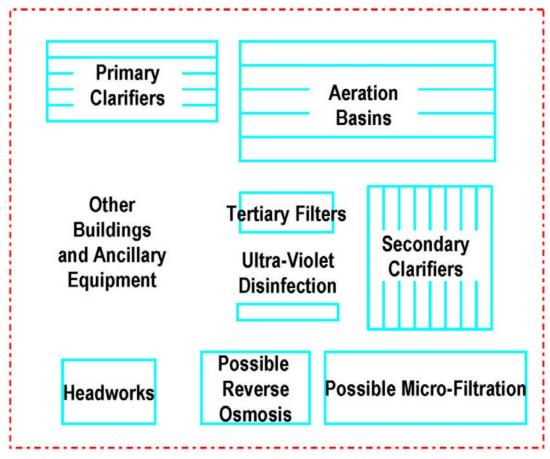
General Site Layout for a 20 mgd New Water Reclamation Plant
